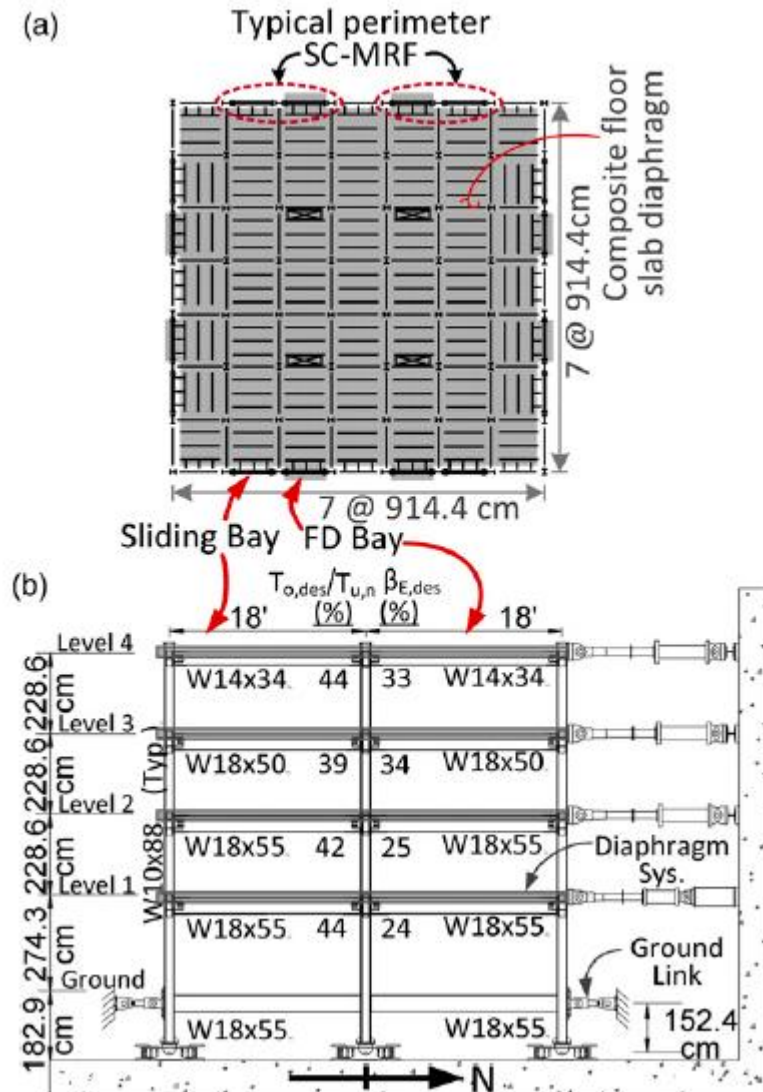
(a) prototype building plan; (b) SC-MRF test frame elevation (Lin et al 2013a,b)
